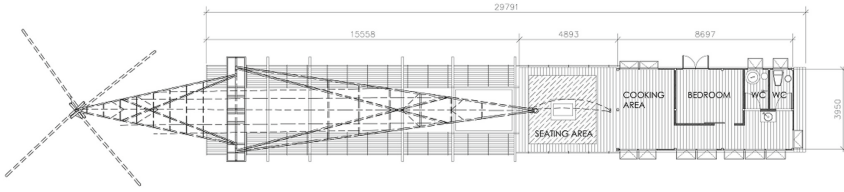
Picture of the new floor plan of the floating vernacular architecture.
